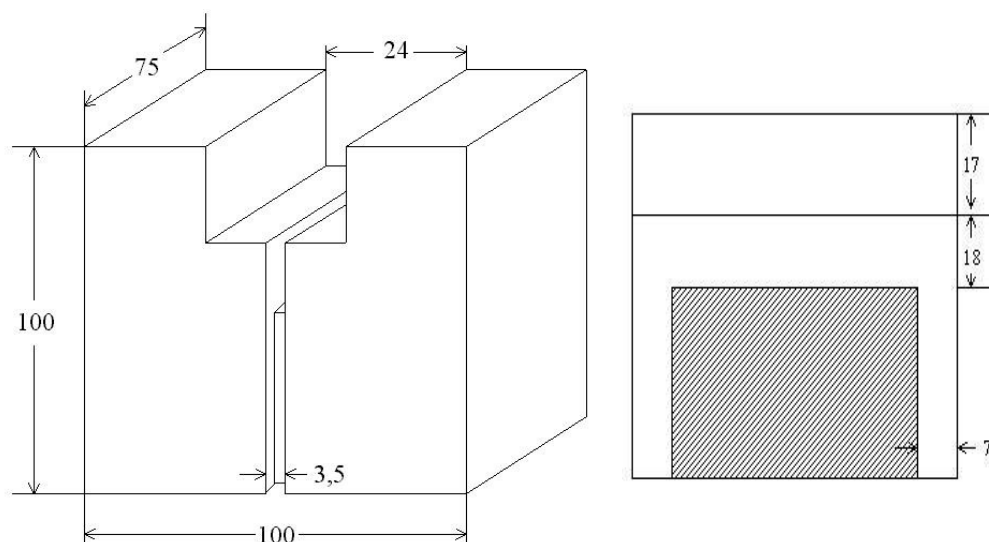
Sample dimensions for the wedge splitting test. (dimensions are in mm).
